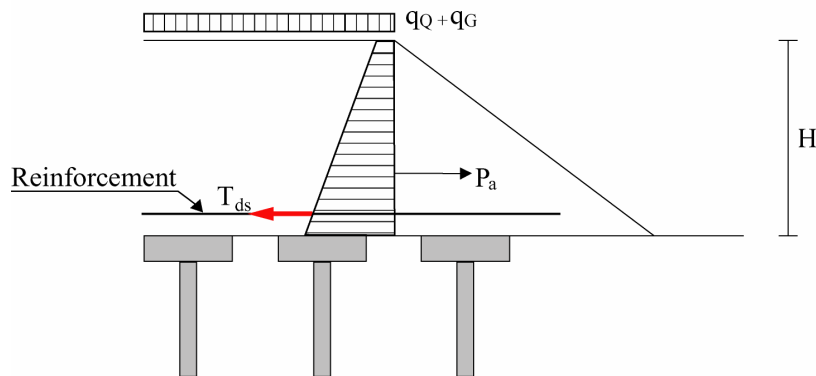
Horizontal force in reinforcement using vertical piles beneath embankment slope.
